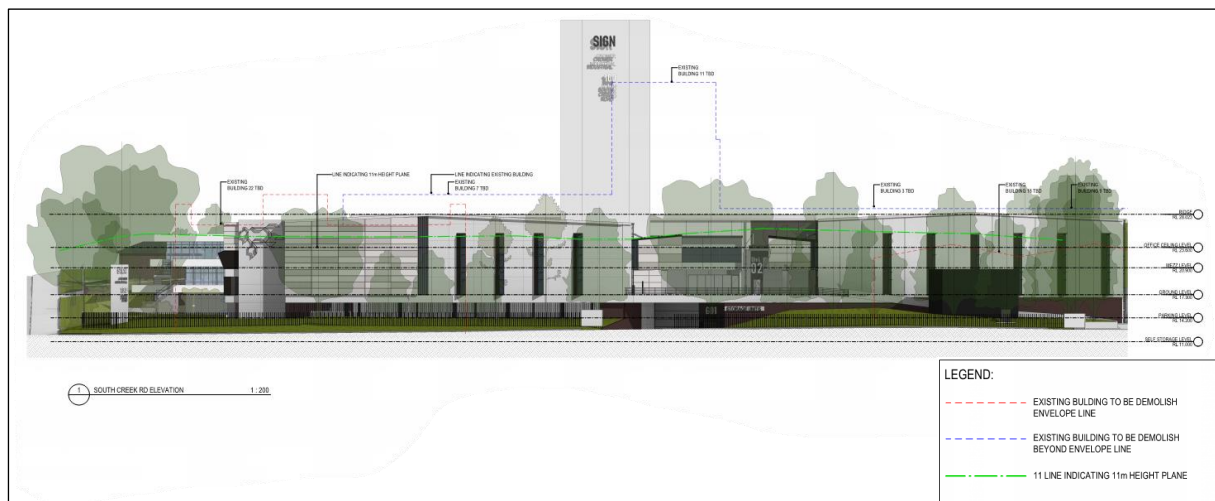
South Creek Road Elevation (Source: SBA Architects, 2019)
